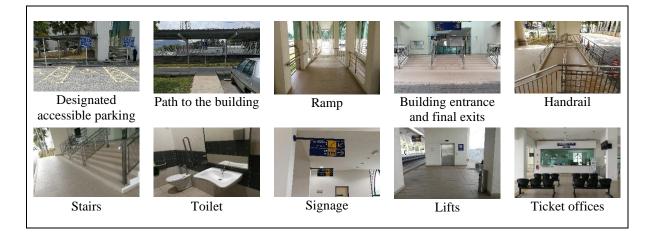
Types of facilities for PWDs to be provided at ETS railway station
